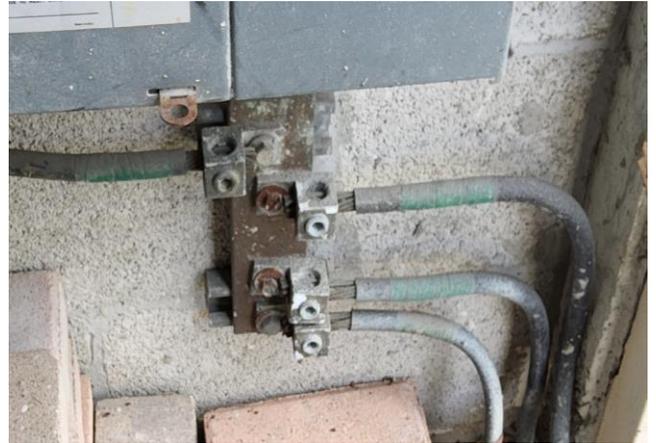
Item 9.1. Meter Electrical Room. Grounding.
